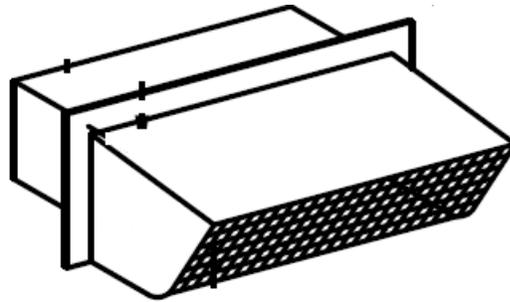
Greenheck Model WC – Hooded side wall vent with built-in birdscreen and damper [32]
